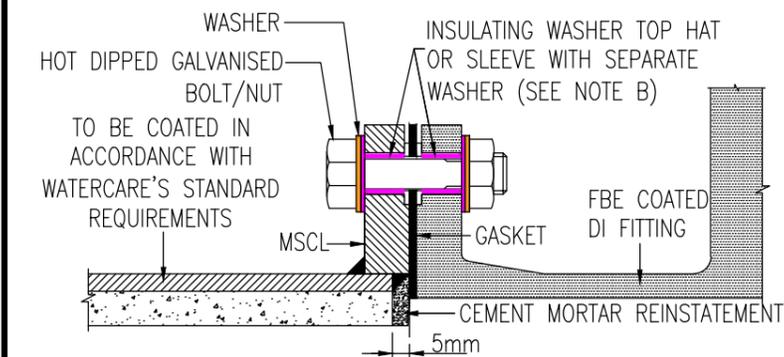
DETAIL A - CORROSION PROTECTION FOR BURIED MILD STEEL (CLS) FLANGES - UNCOATED (4-PART)
